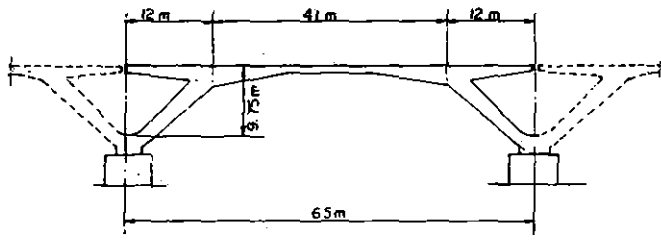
St. Michel Bridge at Toulouse (five spans of 65 m each)
